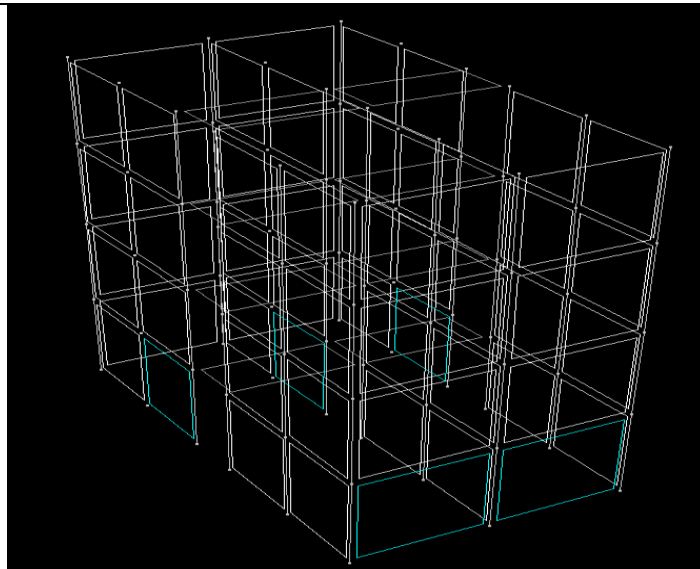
Cracked wall sections at 0.07% drift ratio
